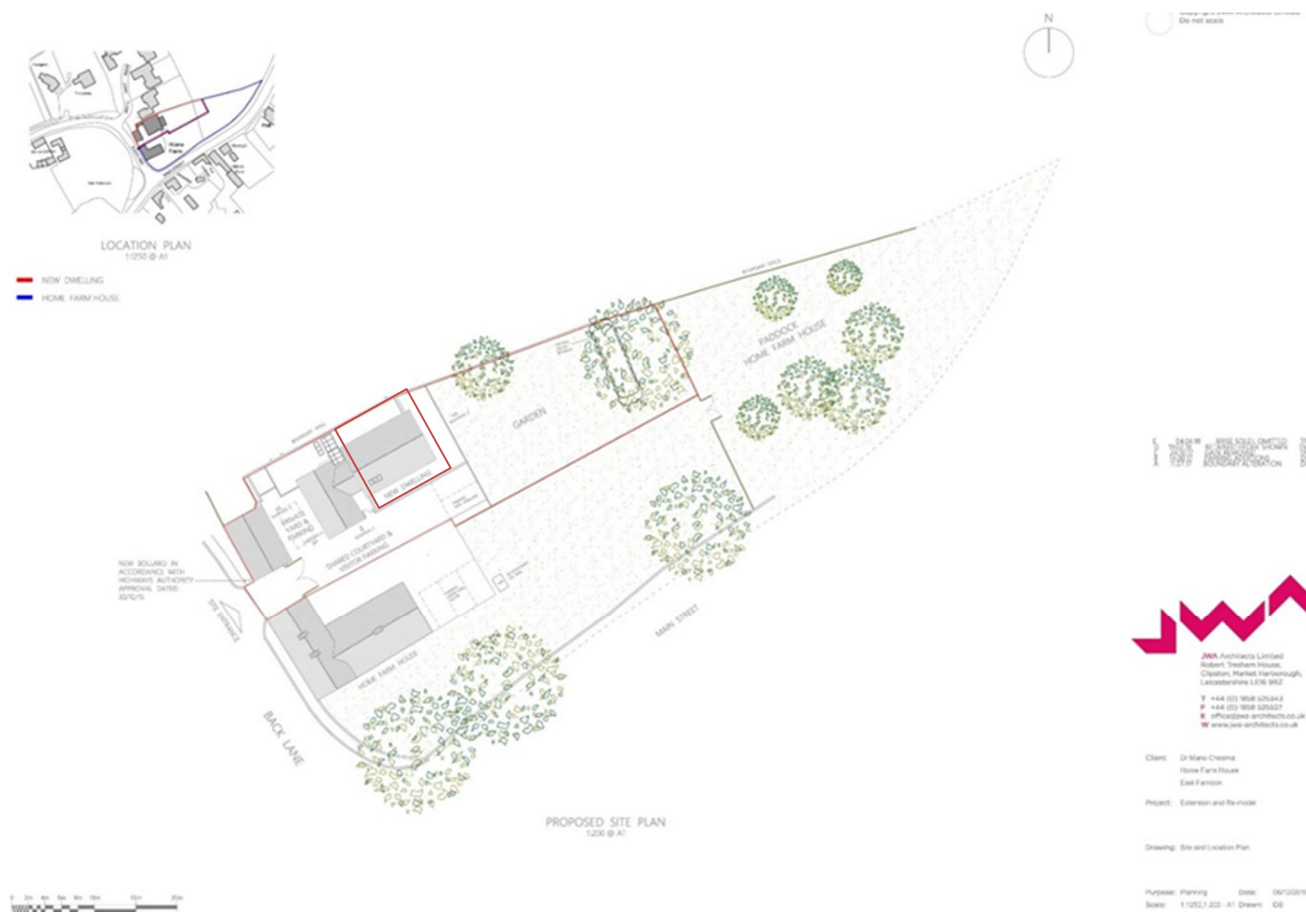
Location of site (new Building area in red box). Plan supplied by client
